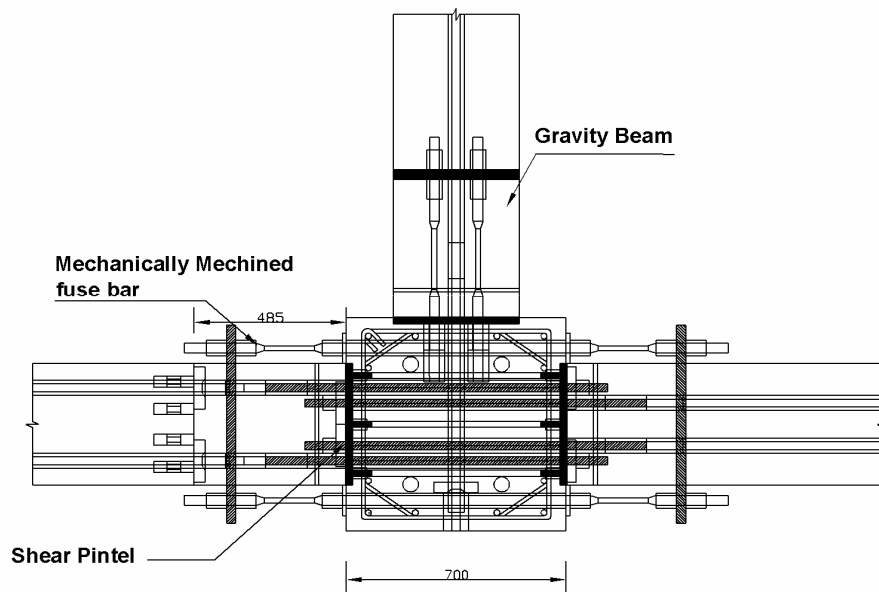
shows the new connection details of the proposed improved beam-to-column connection. The steel angle armour plate used in the proposed new design is placed at a reverse position compared to the present design solution developed in Section 3, with the horizontal flange of the steel angle pointing toward the column face. The concrete surface at the end of the new armoured precast beams is recessed back 3mm from the edge of the horizontal flange of the steel angle. This improves the rocking mechanism of the beams on column faces by reducing the contact area in the connection. No welding is required during construction the new armoured connection as the steel angles are secured on the ends of the longitudinal beam reinforcements through several (Reidbar<sup>TM</sup>) nuts. Two steel stiffener plates need to be locked behind
